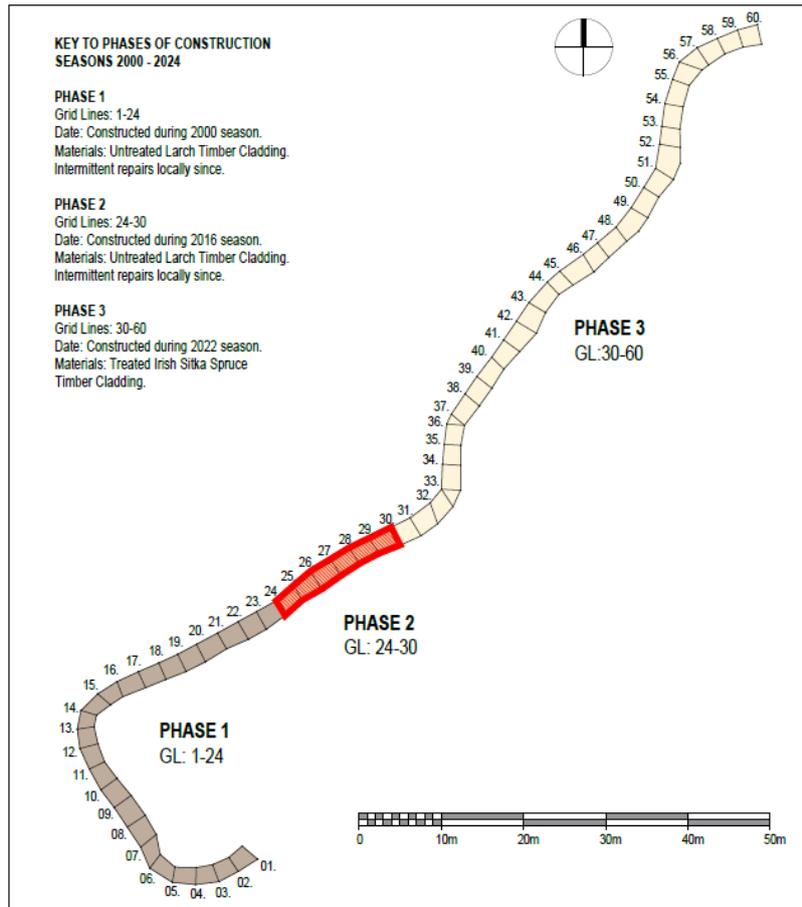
Drawing highlighting in red the 2016 section of the protective canopy at Cross Cove subject to proposed repair works in 2025
